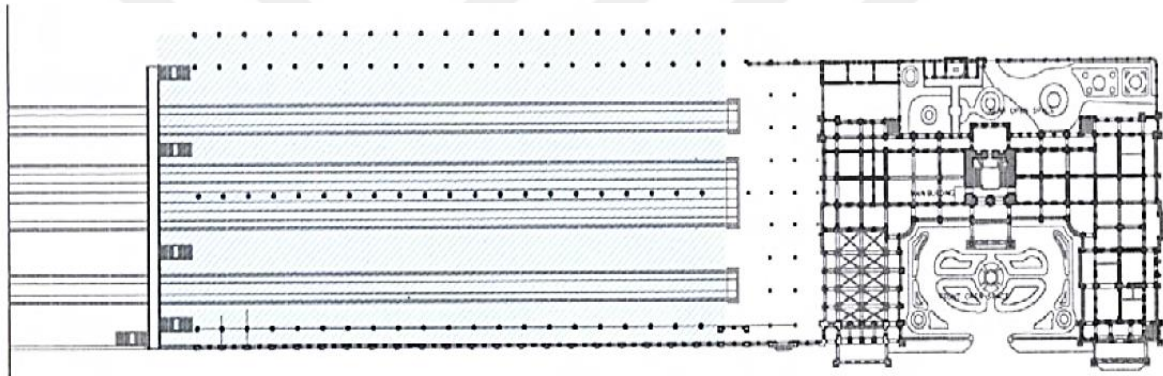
The head house type station of the Chhatrapati Shivaji Terminus, India shows railway tracks and platforms located besides the station building [40]
